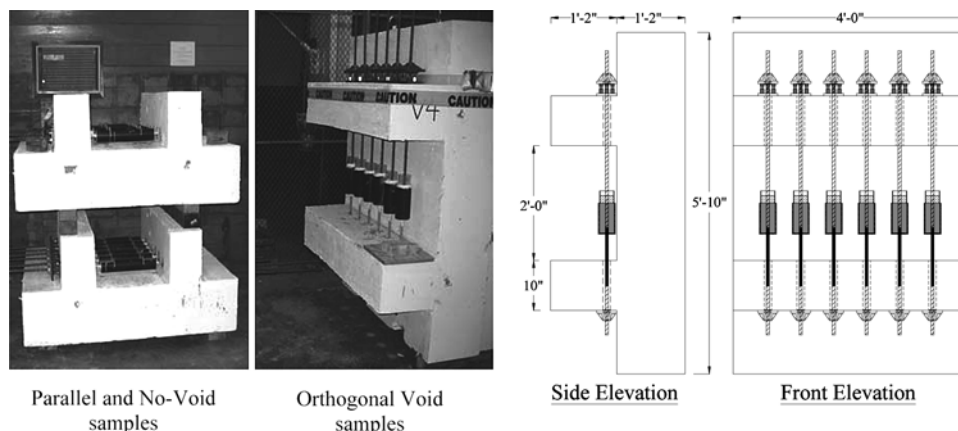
Stressed SC test specimens on concrete reaction frames (schematic shown is of setup for OV samples). (Note: 1 in. = 25.4 mm.)
